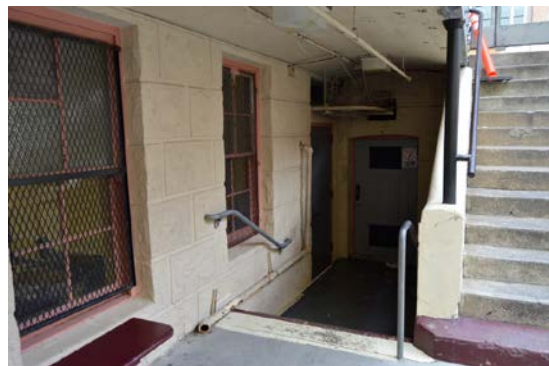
Stairs down to basement entrance near north end of building at east façade. Looking north.
